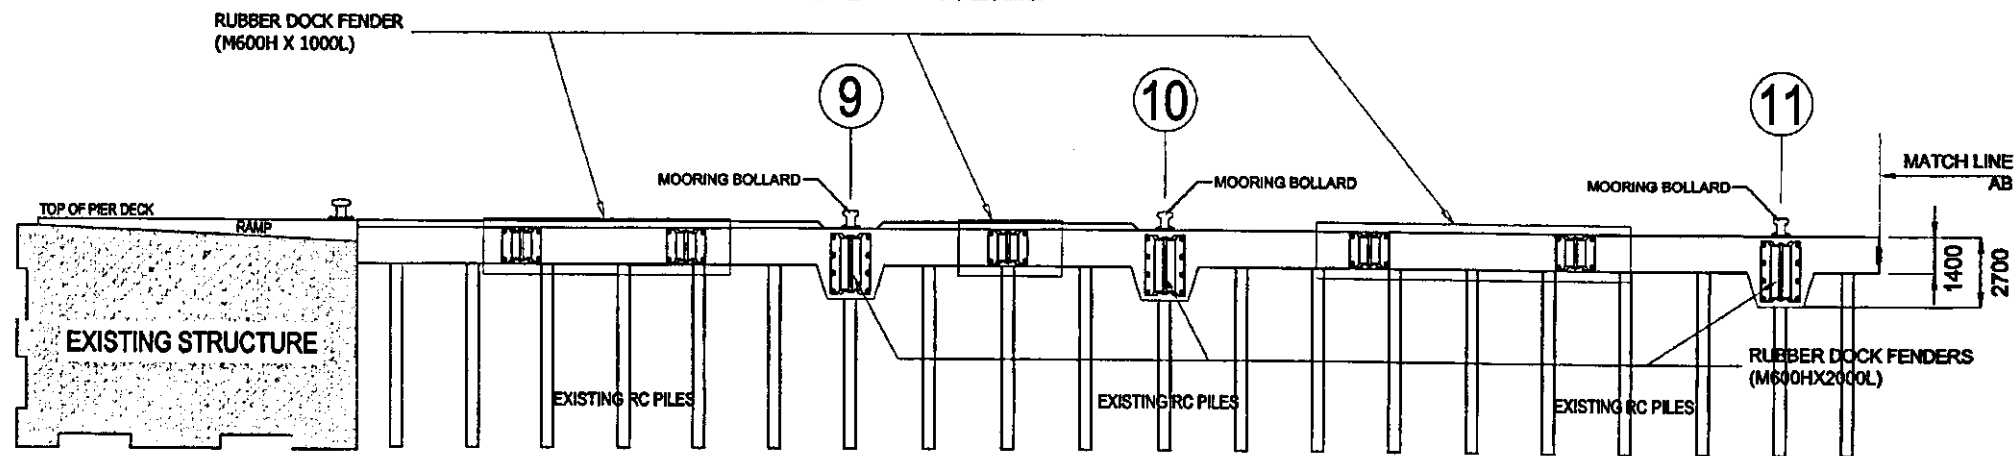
DETAIL INSTALLATION OF RUBBER DOCK FENDERS M-TYPE
